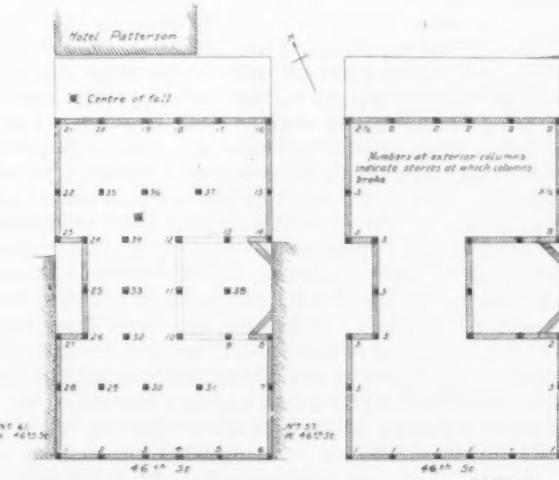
Floor Plan, showing the location of the cast iron columns according to their proper numbers, and indicating the "center of fall" slightly to the rear and left of the center of the building.
